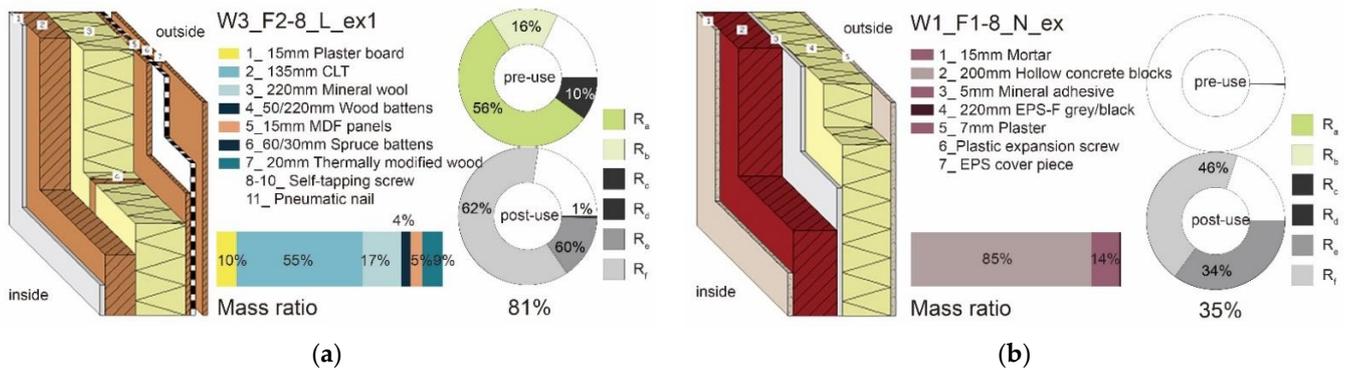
Comparison of recycling potential and mass ratio of CLT and concrete exterior wall components. (a) Recycling potential and mass ratio of CLT exterior wall components. (b) Recycling potential and mass ratio of concrete exterior wall components. (calculation process are presented in the supplementary file).
